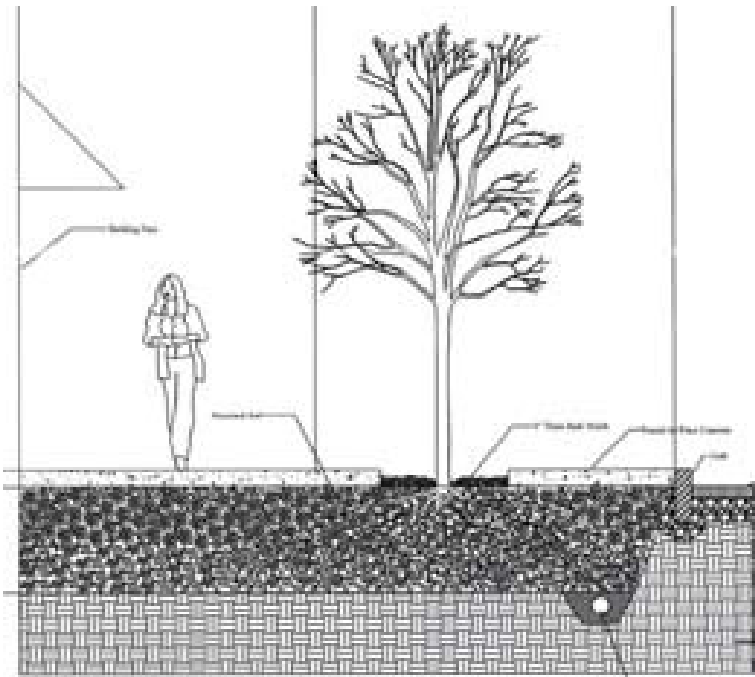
Structural soils provide void space for root growth and load-bearing for sidewalk
